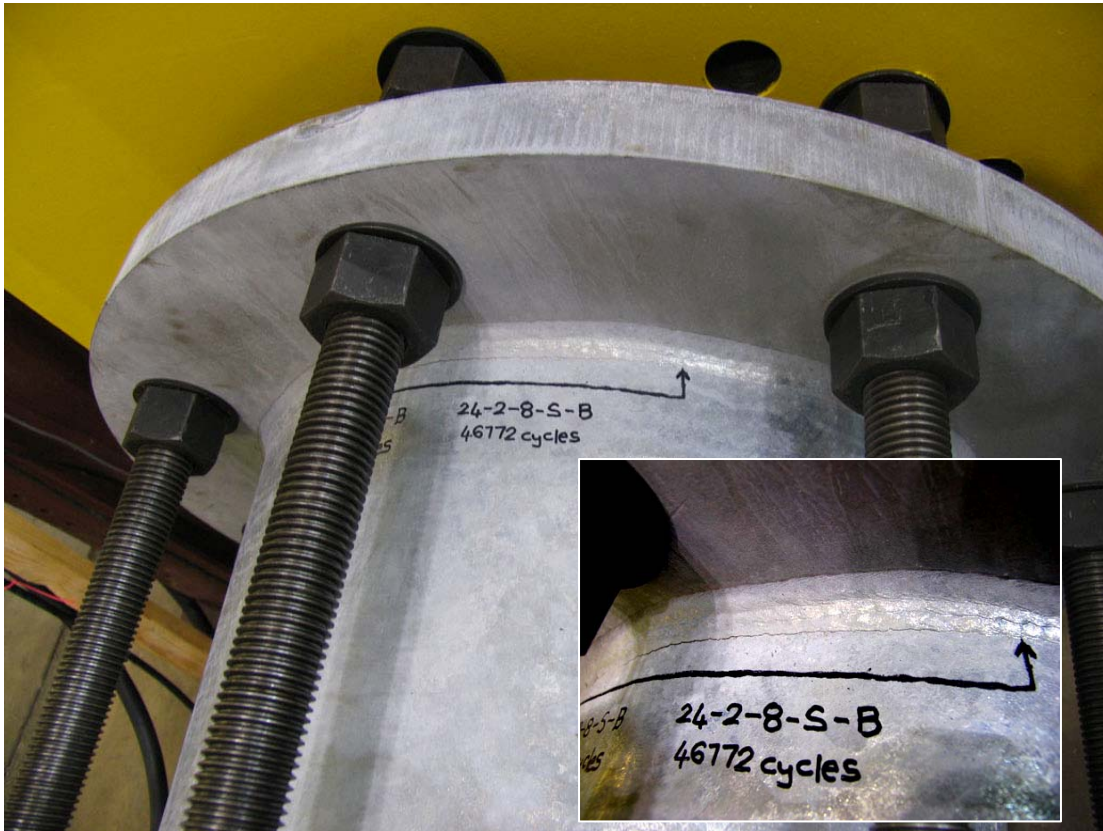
Typical failure of fillet welded socket connection
